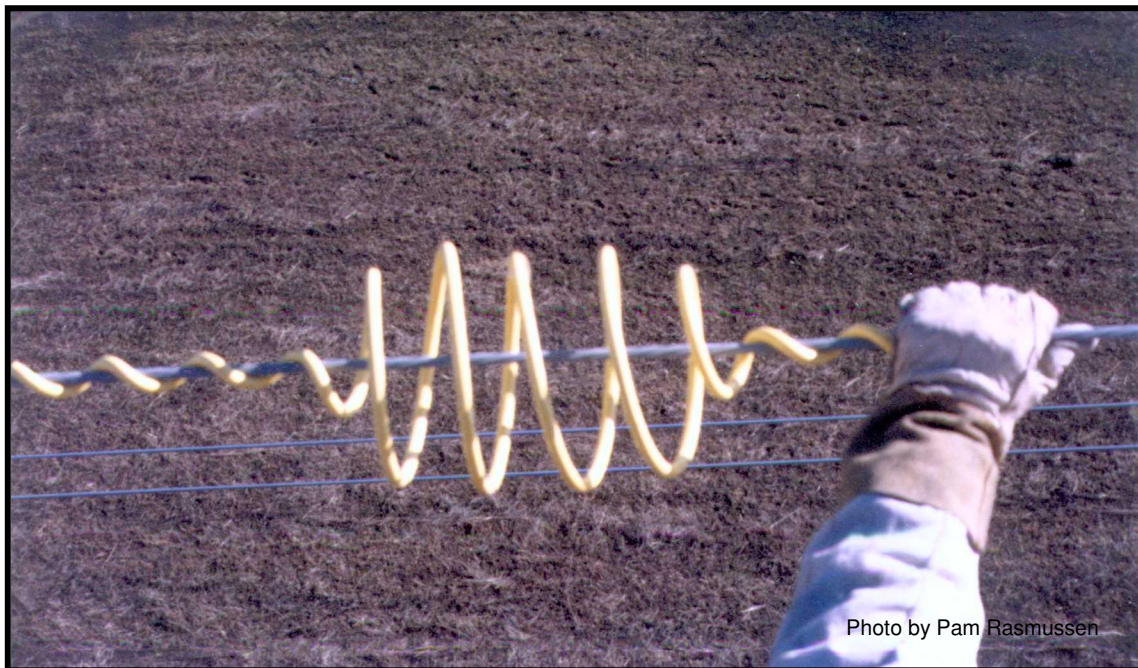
Swan Flight Diverters Being Placed on a Static Wire
